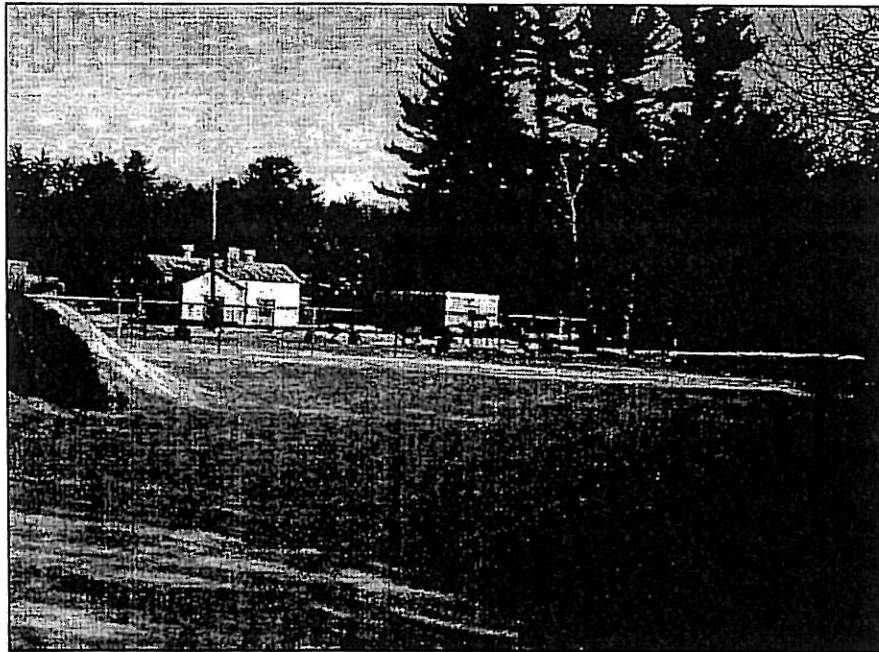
View of existing Laconia Meter Station fencing (left) and proposed additional temporary workspace from Broken Bridge Road, view facing southeast.
